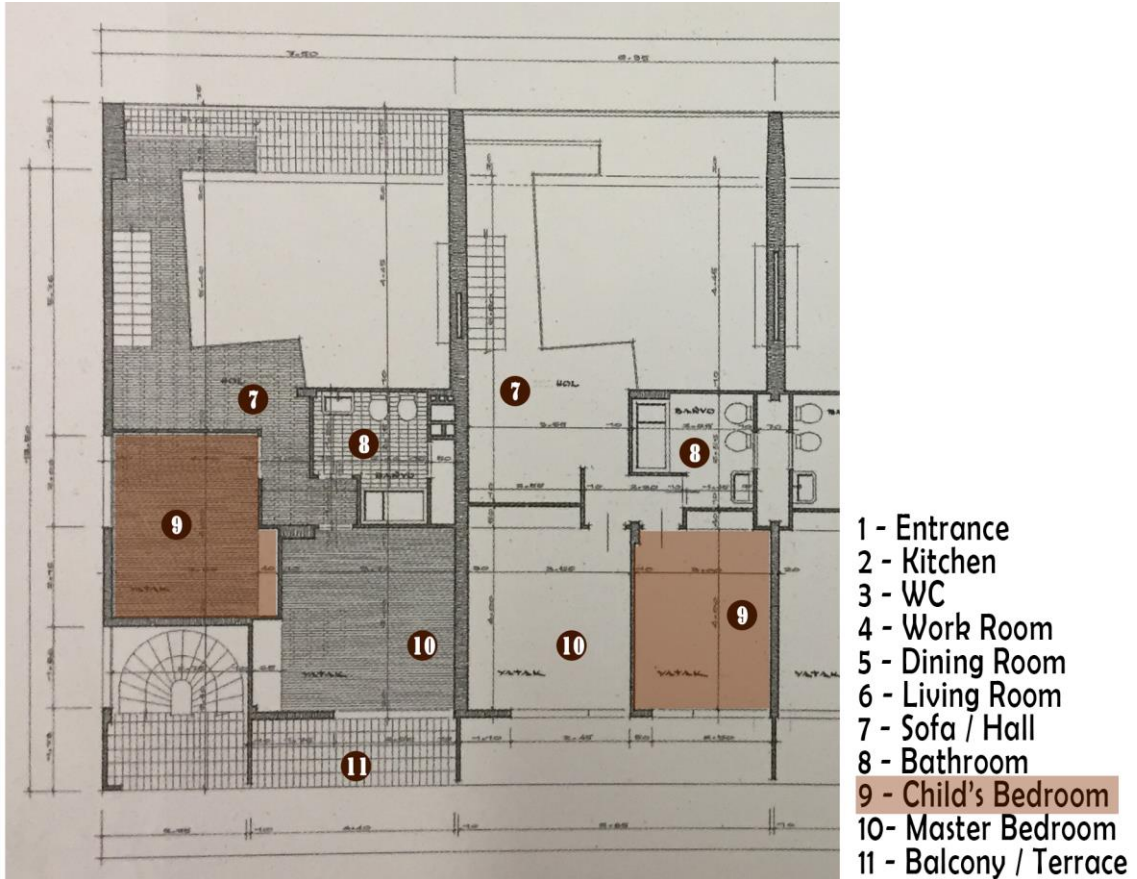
The upper floor plan of Cinnah 19 Apartment, Ankara (Source: Bancı, 2021)
